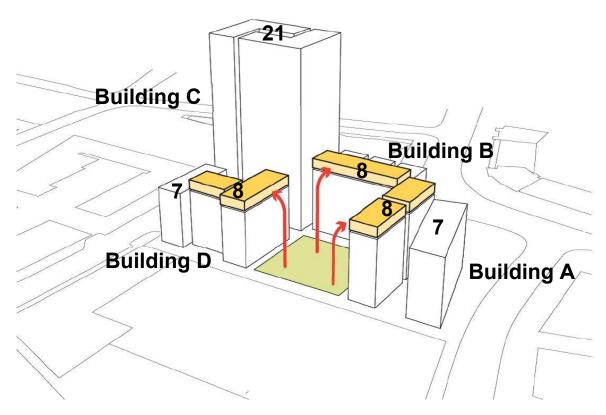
Proposed Stage 1 building envelopes and proposed height in storeys.
